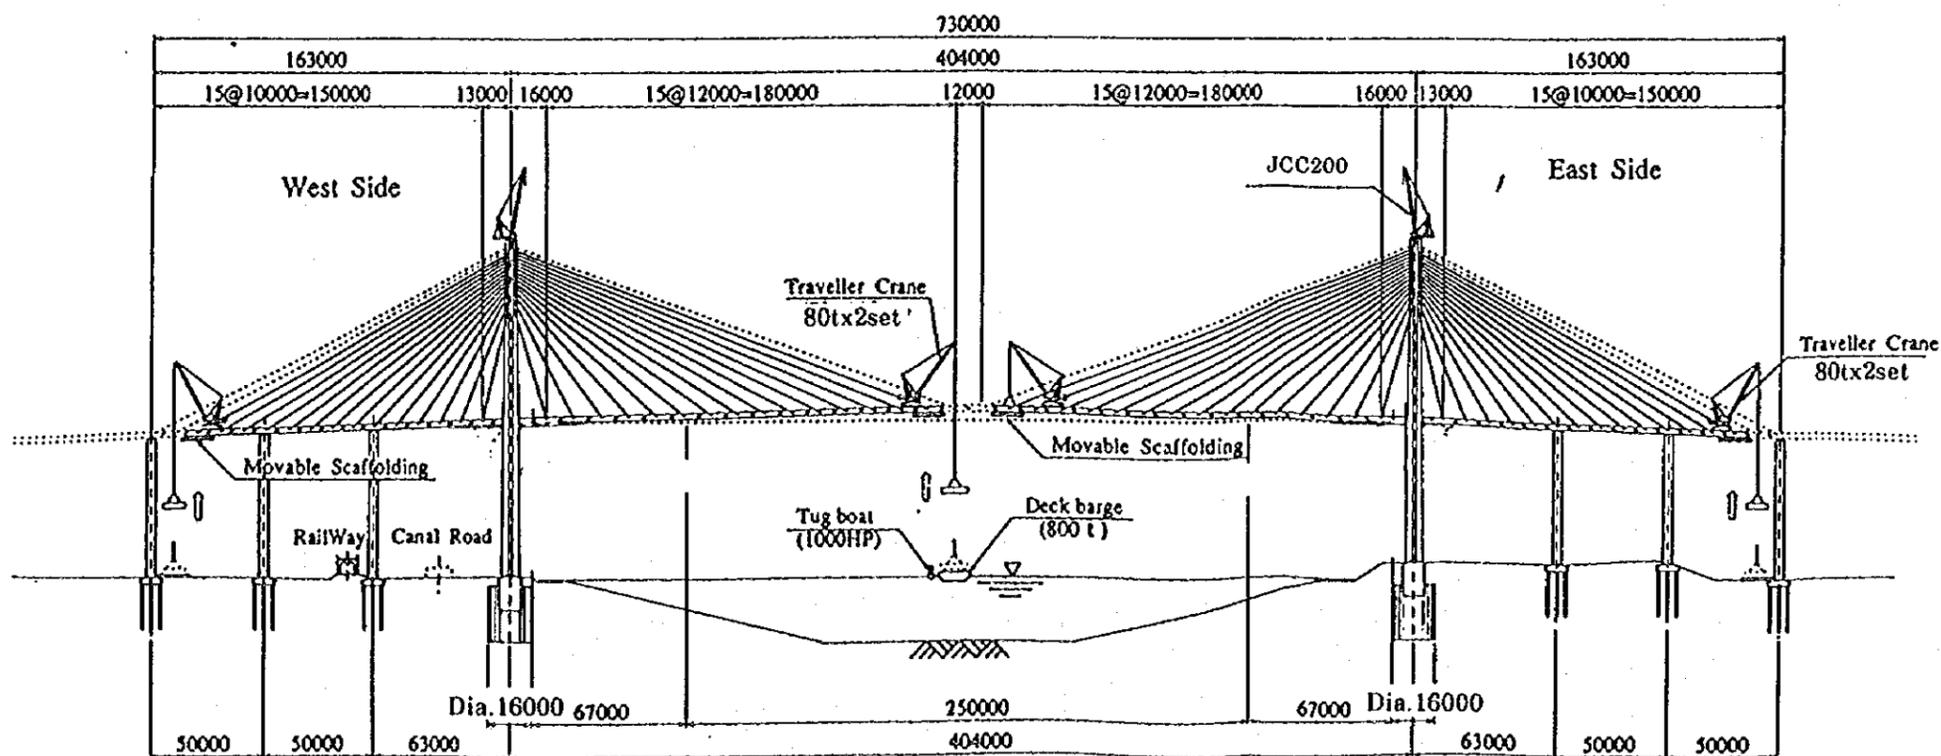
Conceptual Construction Sequence for Cable Stayed Bridge
